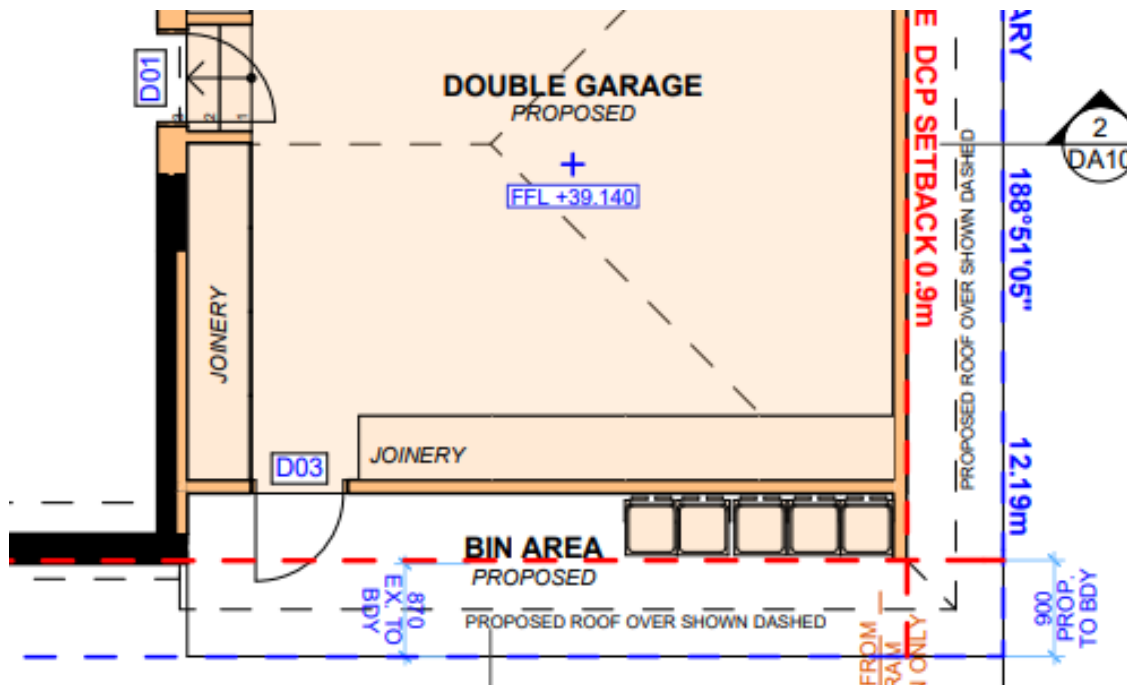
Excerpt from Architectural Drawing DA07 Proposed Ground Floor Plan showing the southern side setback
